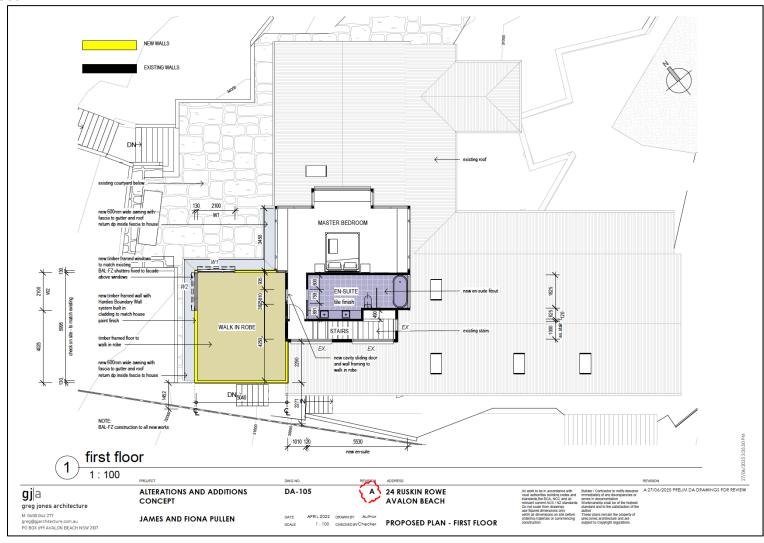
ILLUSTRATES PROPOSED SITE PLAN
